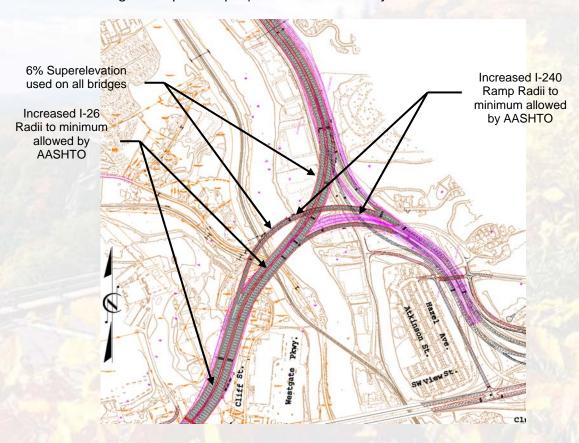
Alternative 4B Revised French Broad River Crossing Concept
